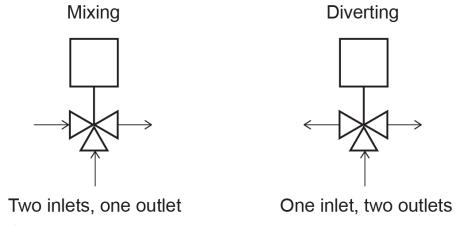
Mixing valve versus diverting valve. (Skilled Trades BC, 2021) Used with permission.
